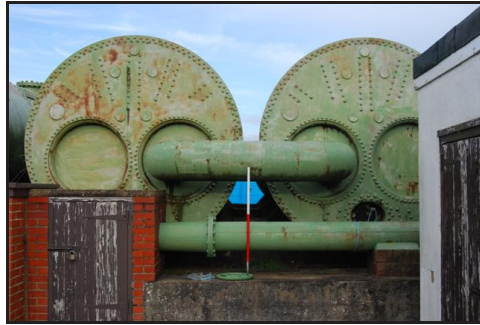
& 5 Southeast Elevation Looking Northwest
